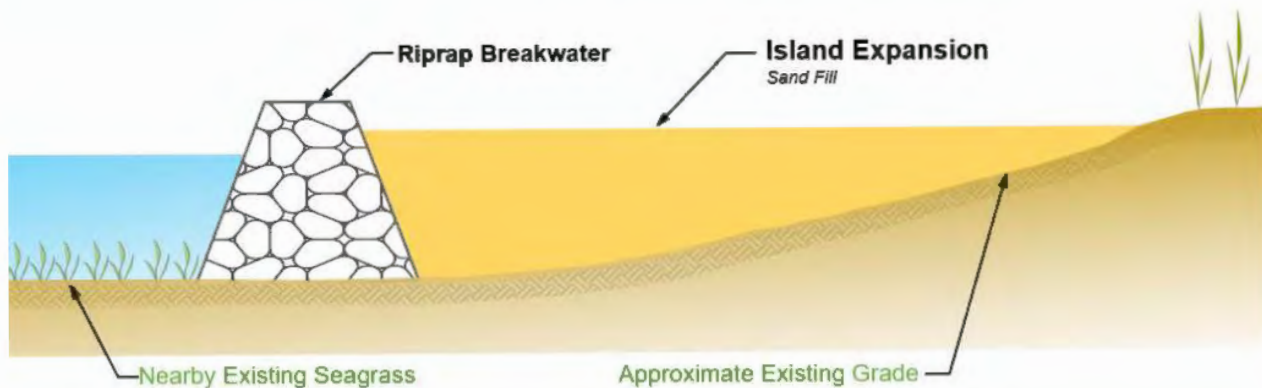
Conceptual section view of Alternative 2: riprap breakwater with beach expansion
